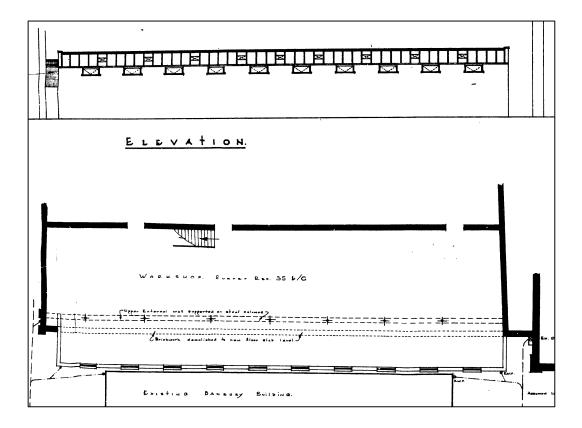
The 'Lady Casters Department' extension to K3. The crosses mark the placement of the columns in Building K3. The slip area lay to the right. There was a single-storey shed nearest the canal, erected in 1966 which was used for storage by the retail carpenters who constructed shelving and display materials/ furniture for trade shows and UK concessions.
